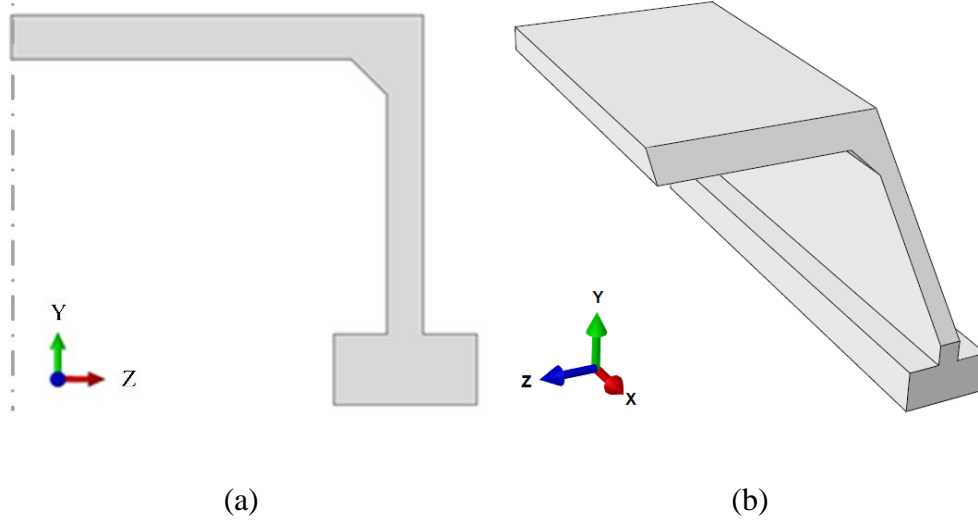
Schematic illustration of one-half of the cross-section for culverts BR-1 and BR-2:
